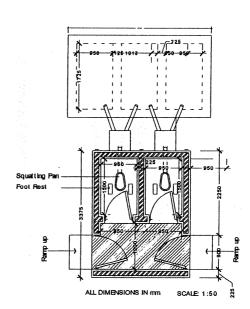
Floor Plan of the 2-compartment Pour Flush Toilet
